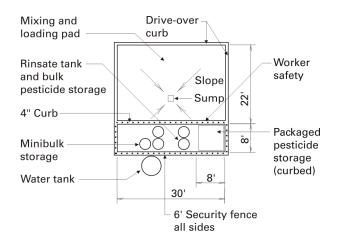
Small-scale facility, plan view. Optional roof over entire facility.
